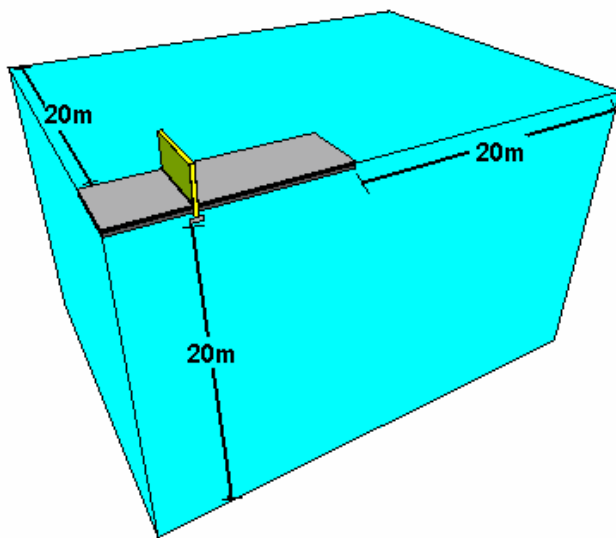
Complete model of ground floor and separating wall (showing ground dimensions)
